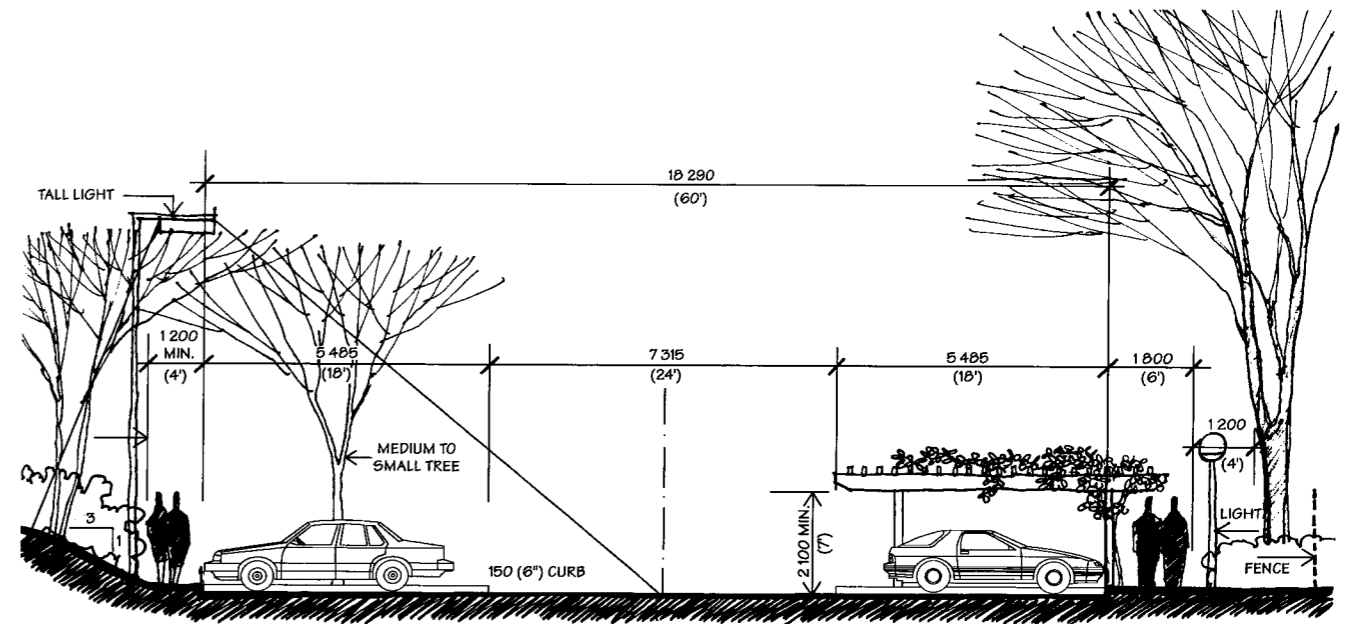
Auto parking elements and typical spatial dimensions. Typically plantings, land form, screens, and structures are used to create a more hospitable transition from auto to pedestrian path.
